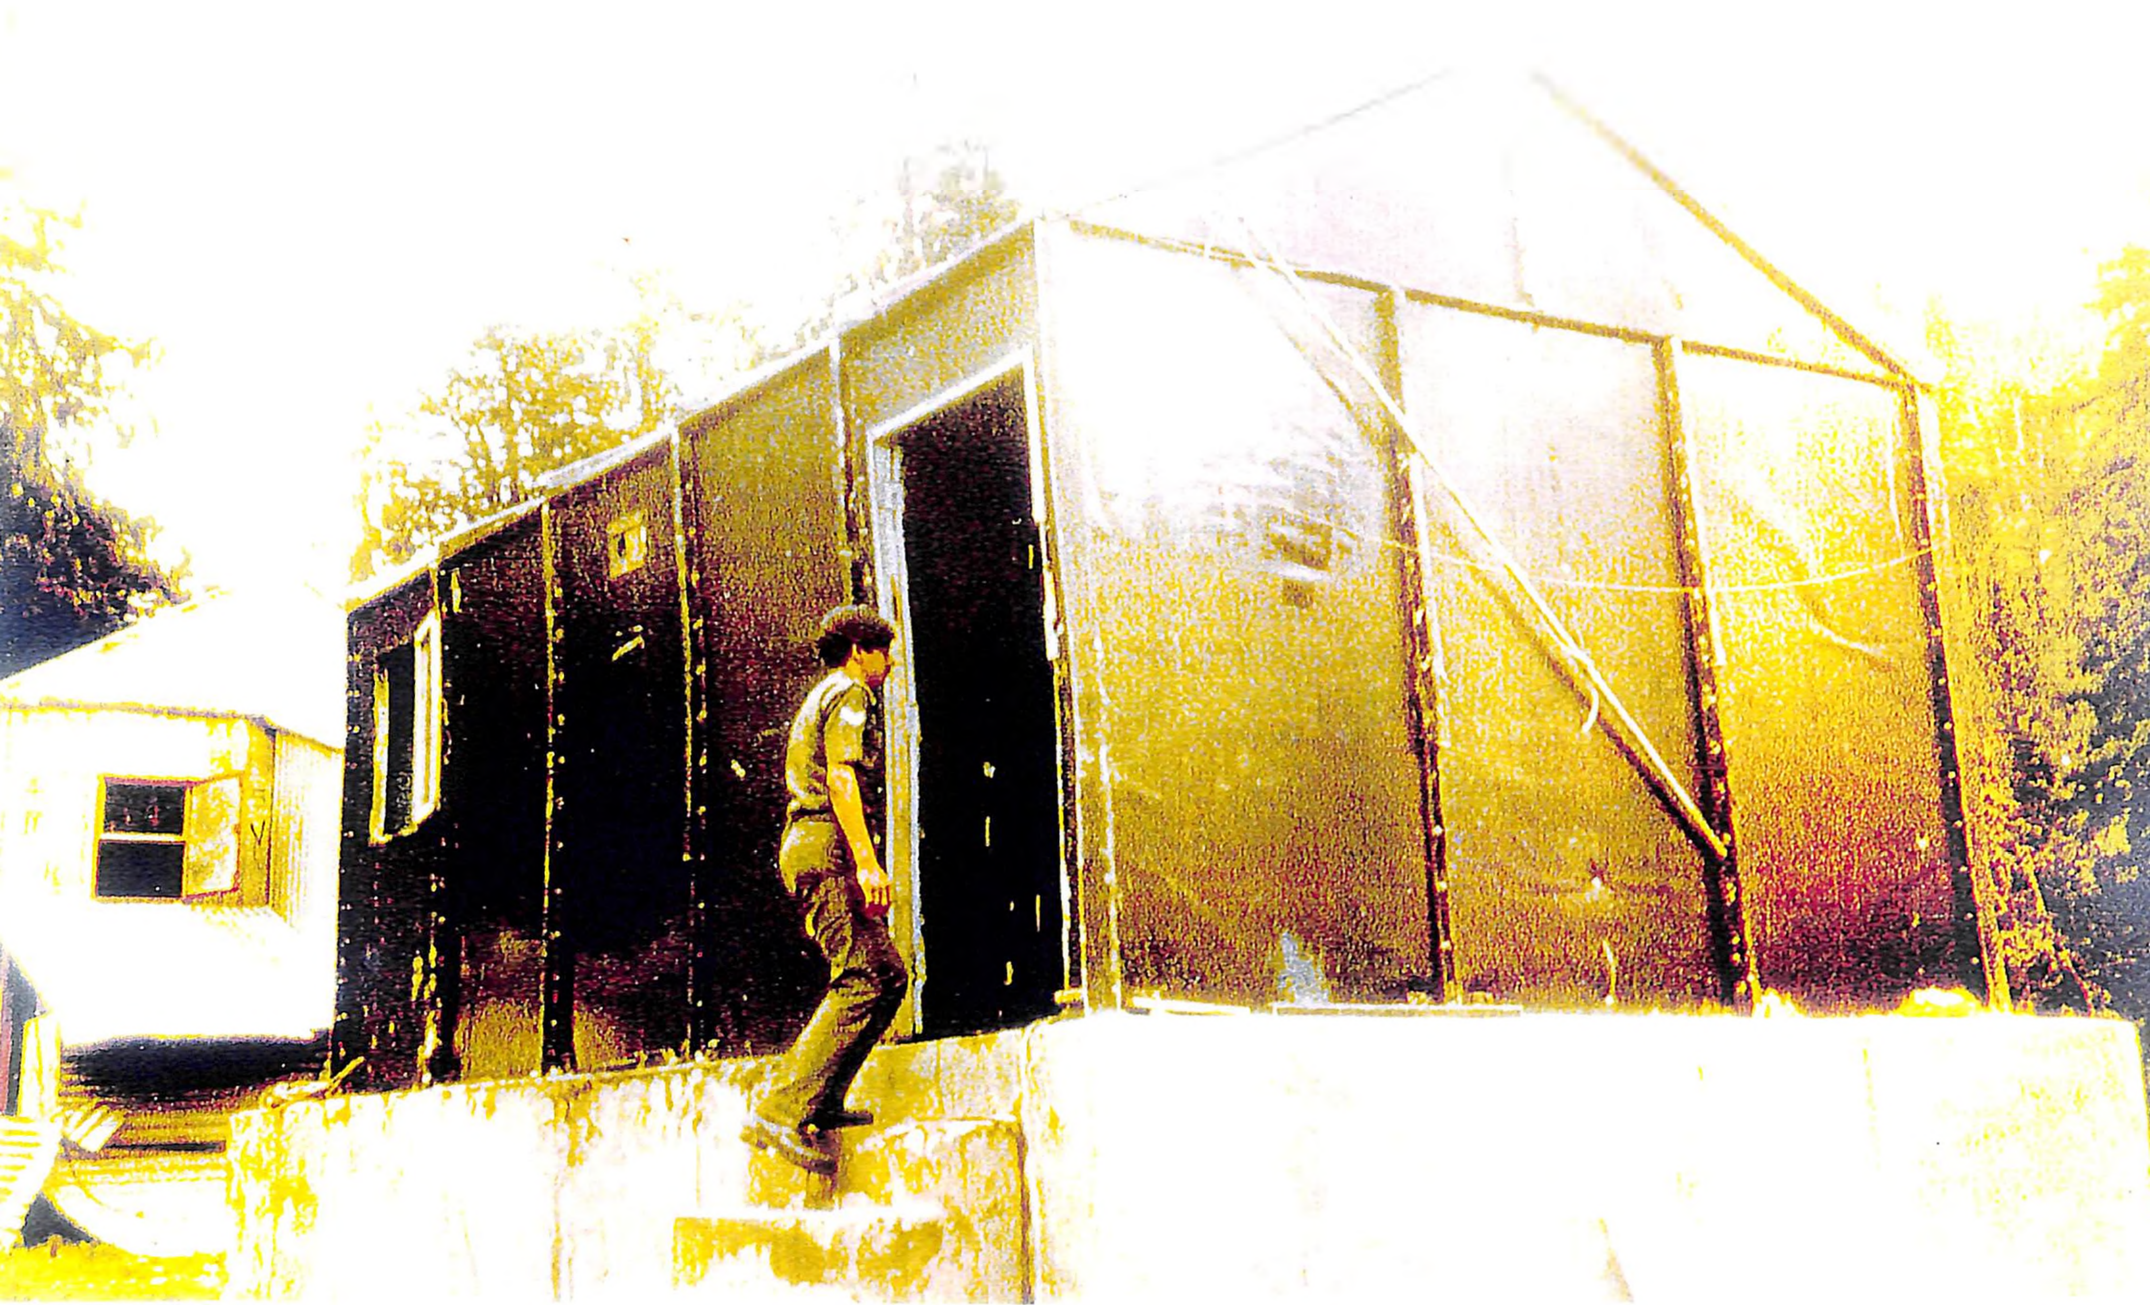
IMPROVISED PORTABLE STRUCTURE
